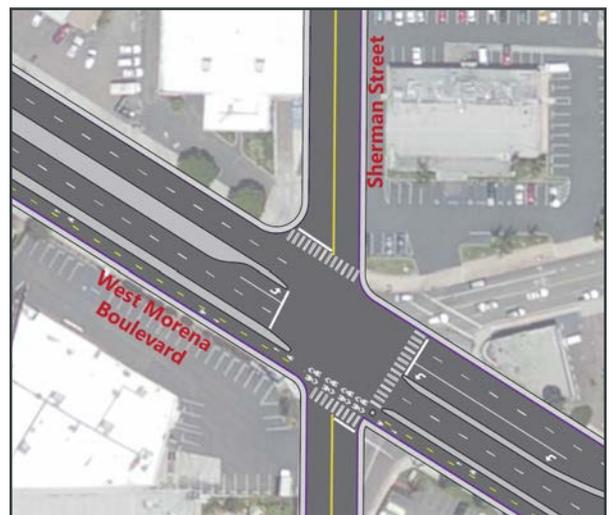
Proposed Intersection Conceptual Design for Improvement 9
